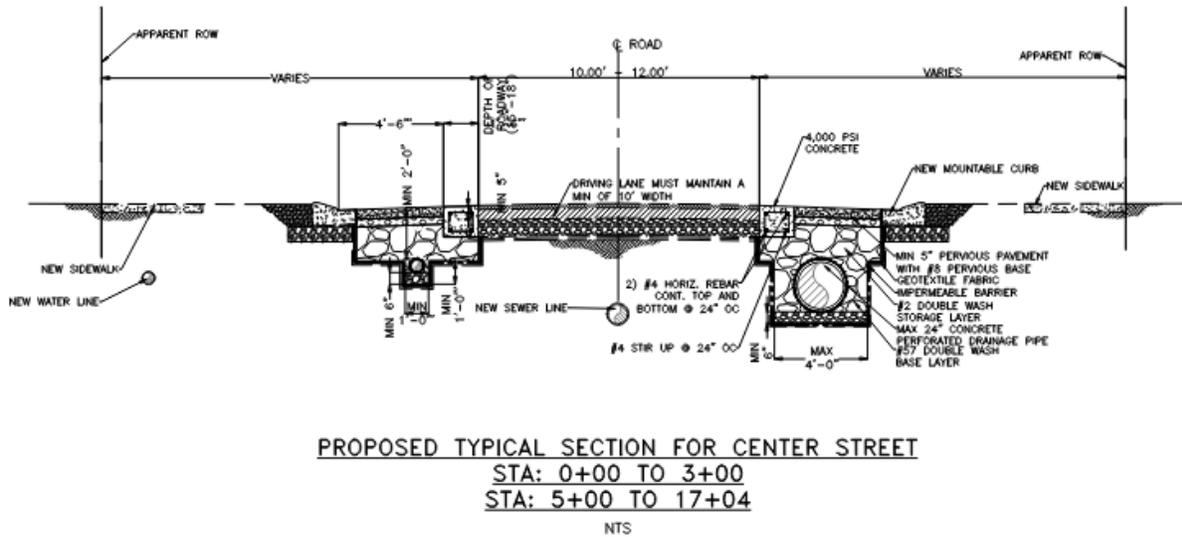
Typical Section of Project Alternative No. 2 – Center St.
